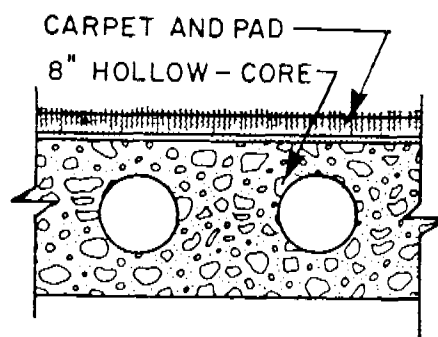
Precast Concrete Hollow-Core Floor for Residential Building (3)
